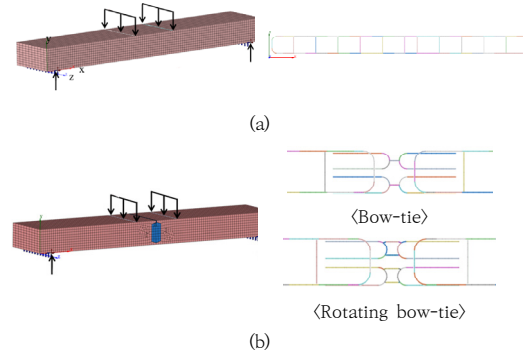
Concrete and rebar modeling of straight member (a) RC (b) Bow-Tie and Rotating Bow-Tie PC
